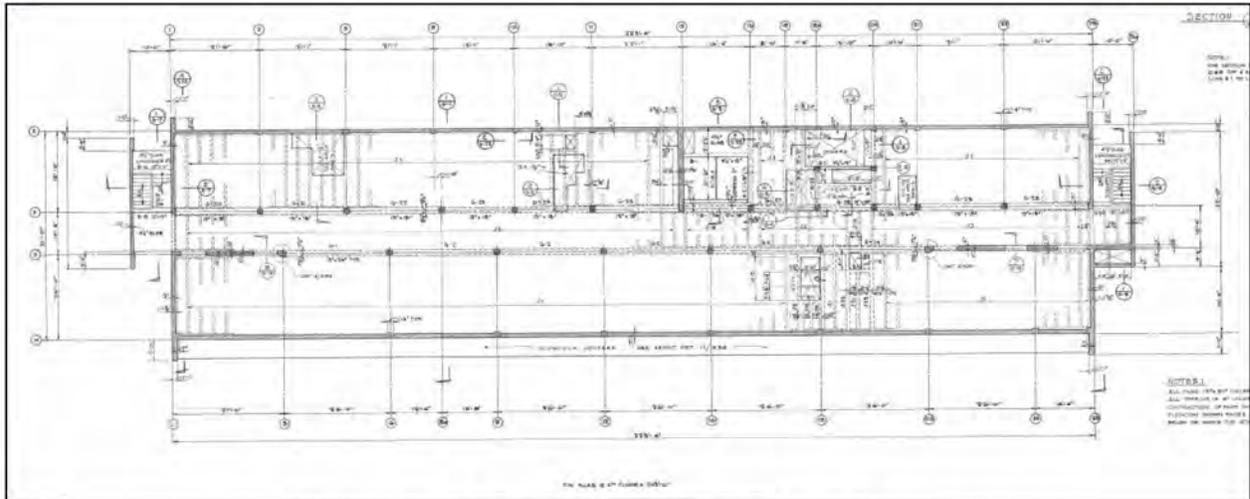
4<sup>th</sup> Floor Framing Plan (North Tower)
